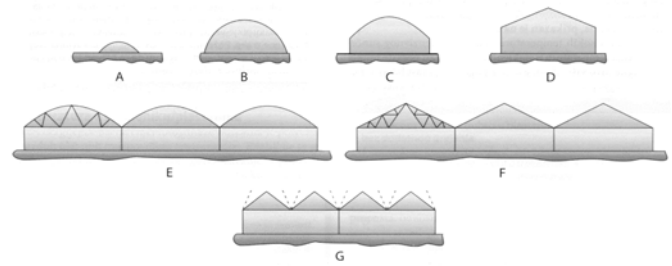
Type of greenhouse construction included in the model (A – low tunnel, B – high tunnel, C and D – single greenhouses, E, F, G – multi-span greenhouses) (Martinov et al, 2006)
